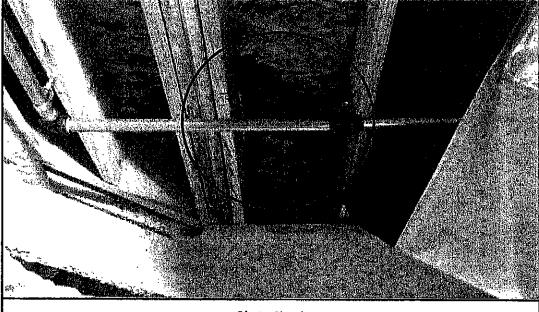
Water damaged OSB showing signs of mold in attic area.
